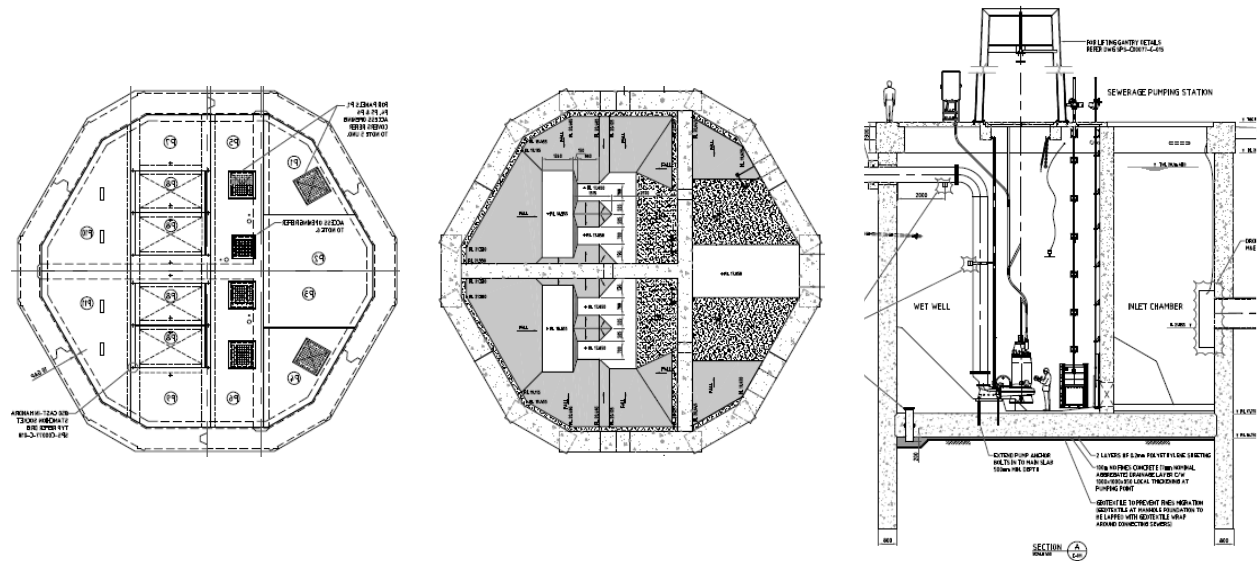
Officer South SPS wet well Shaft. From left: cover plan, benching plan, and section
